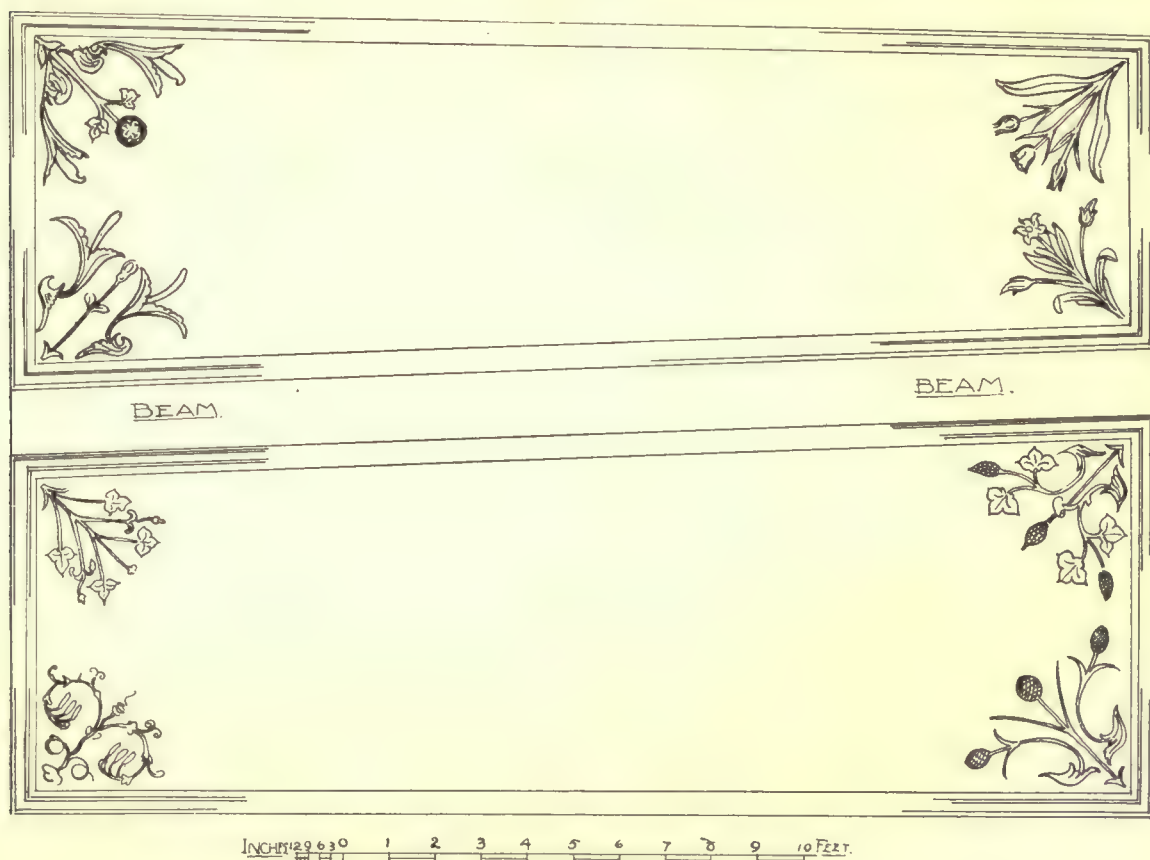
Ceiling at No. 67 South Street, Exeter.
